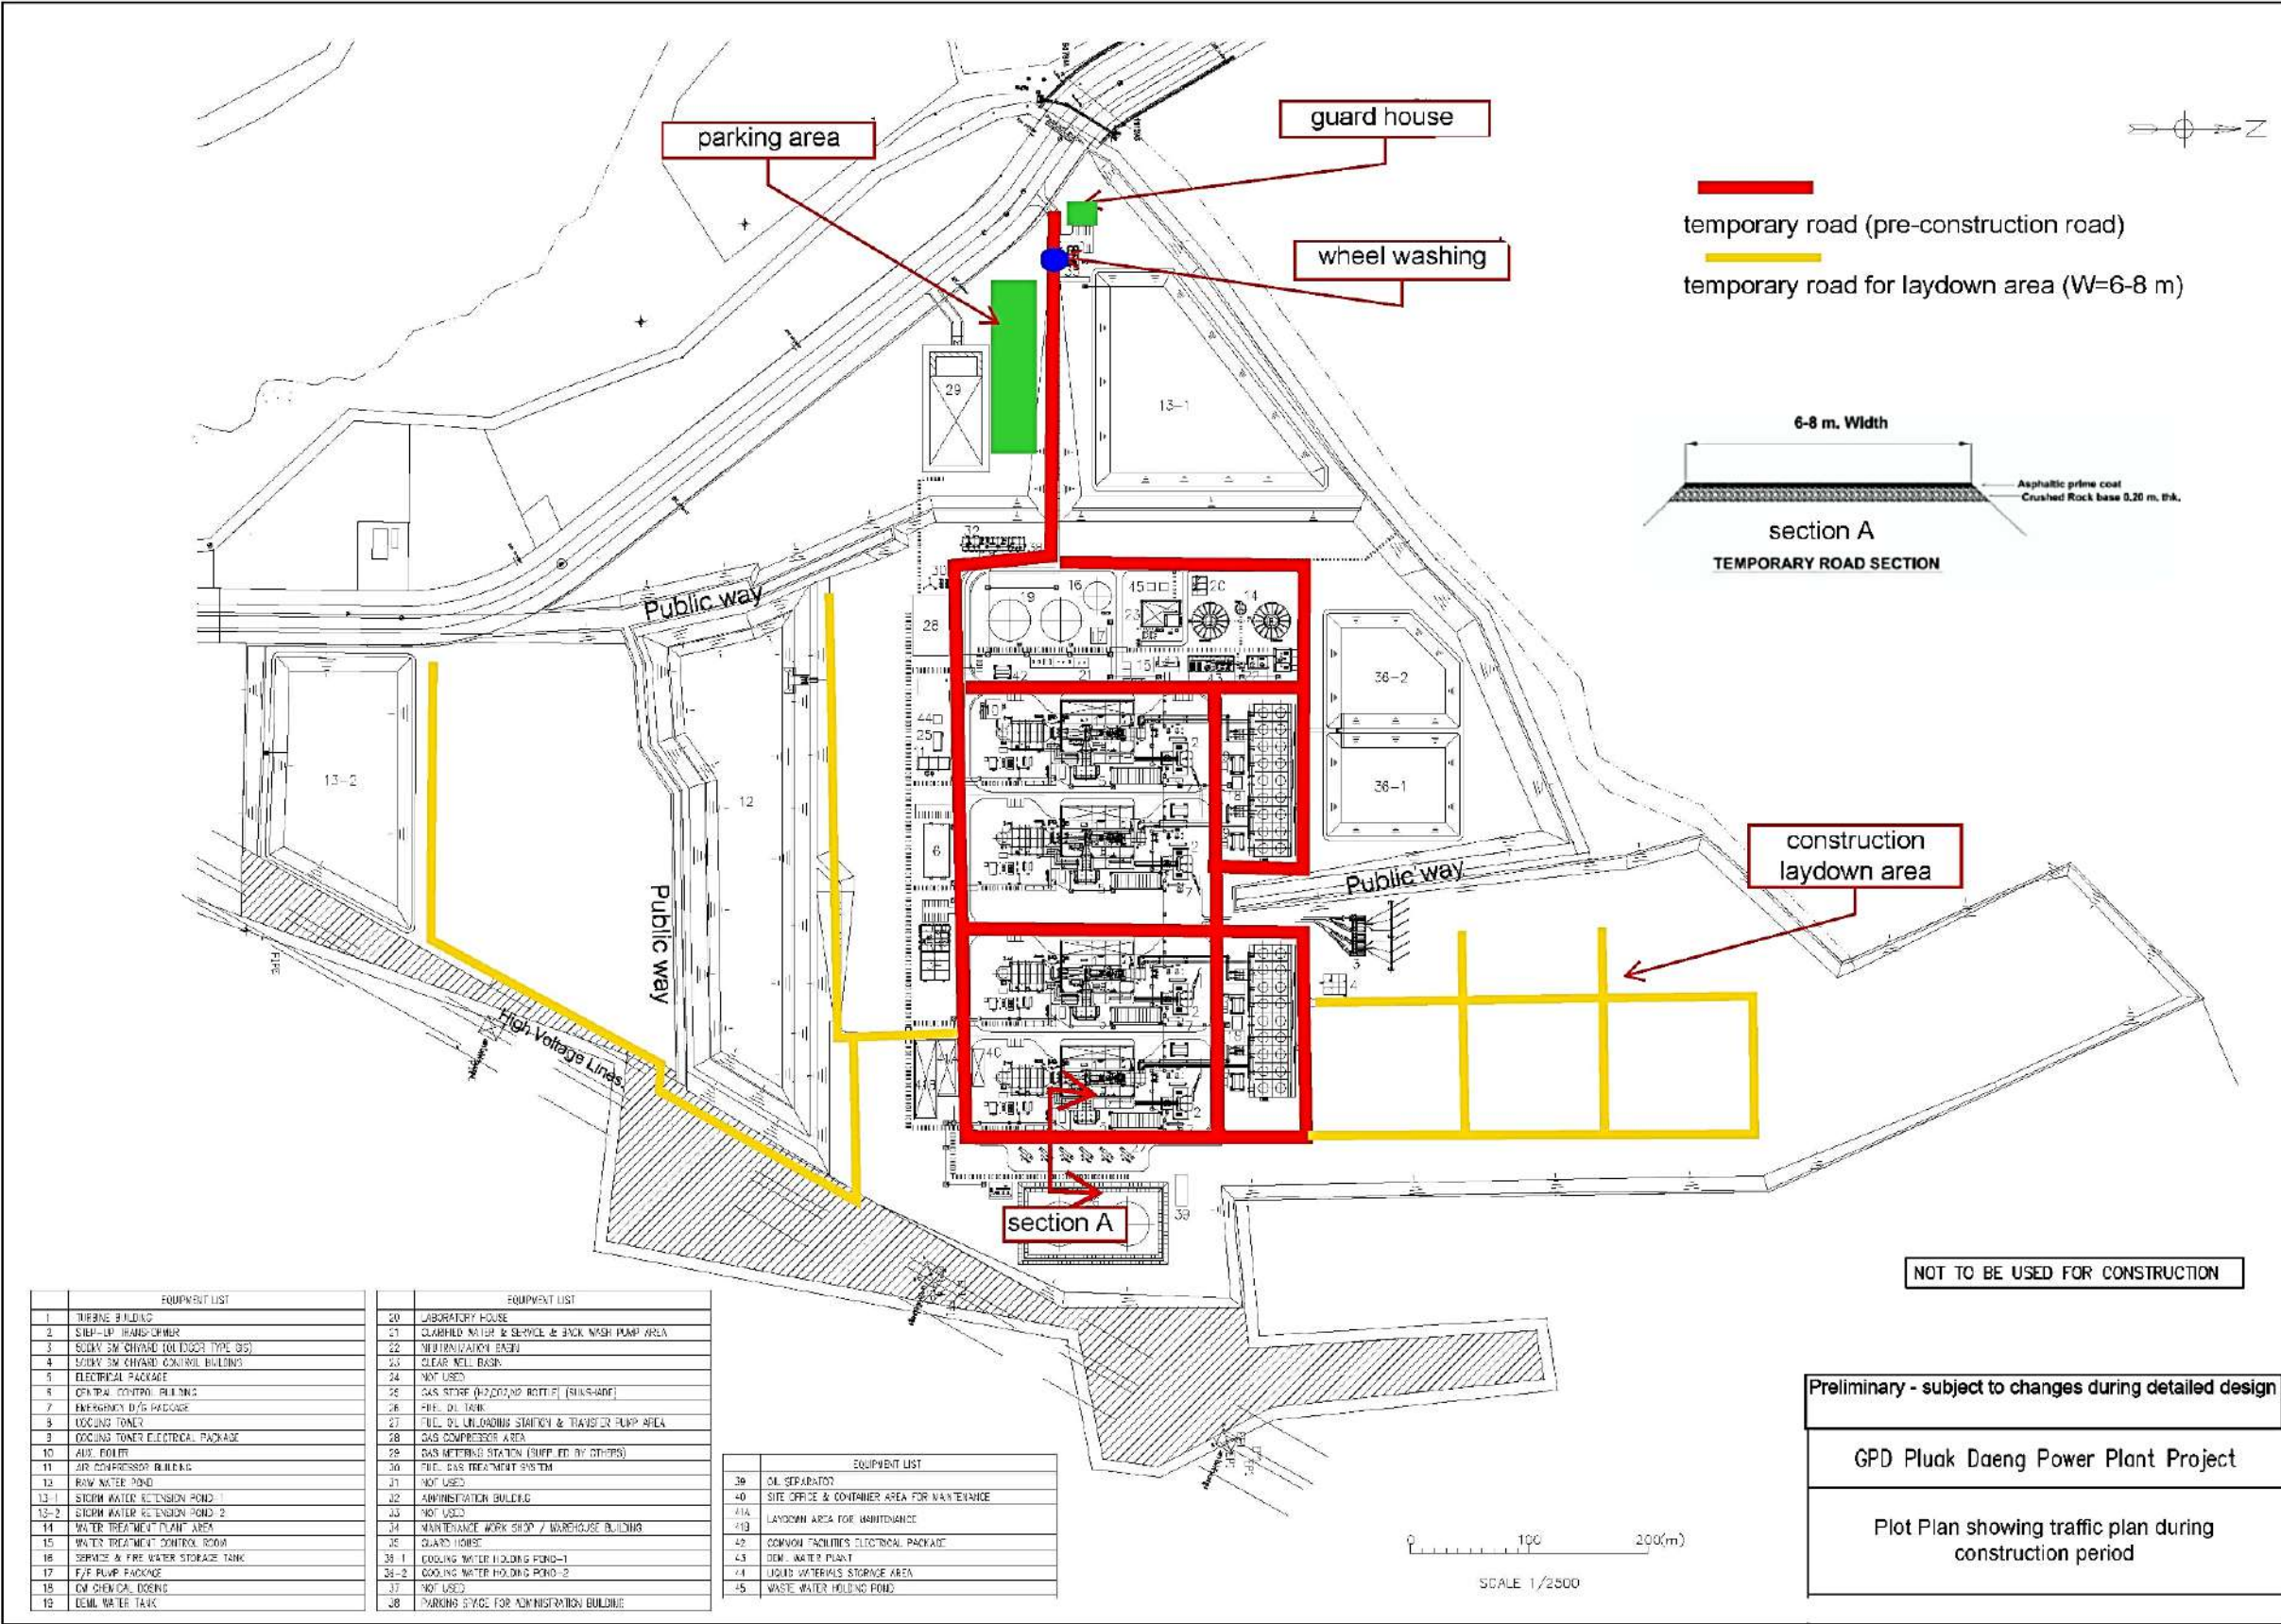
TRAFFIC PLAN DURING CONSTRUCTION PHASE
